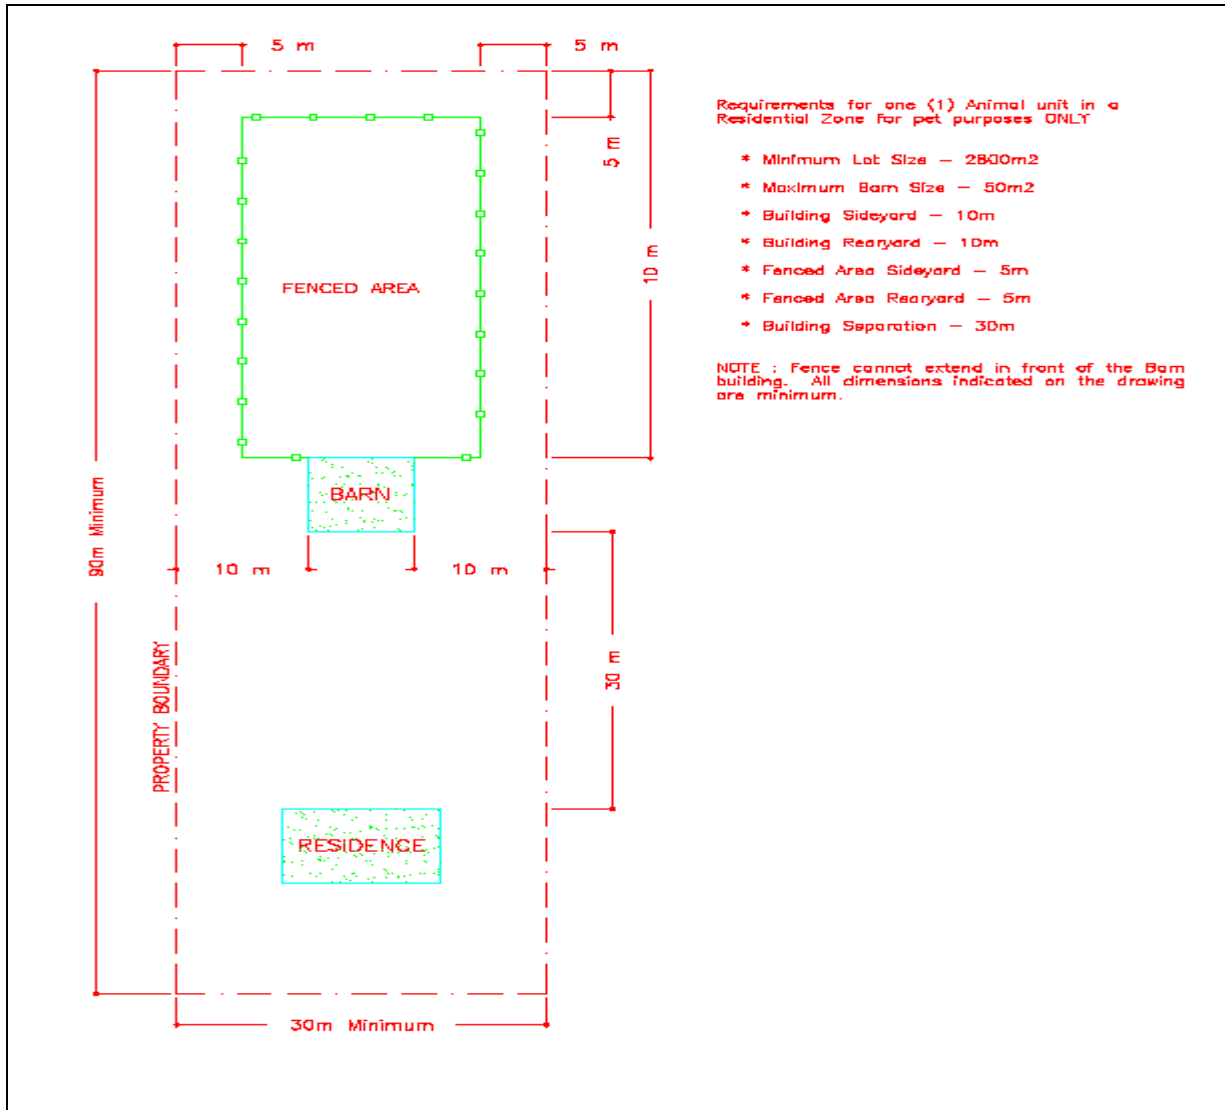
Siting and Construction of Barns and Fenced Enclosures
